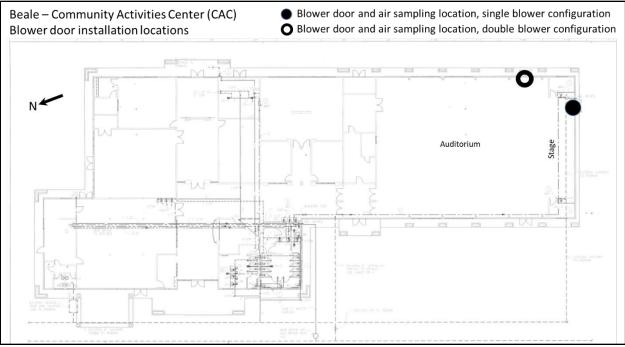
Oct. 27-28 pressure test blower door installations and air sampling locations, Beale AFB Community Activity Center, Building 2425.
